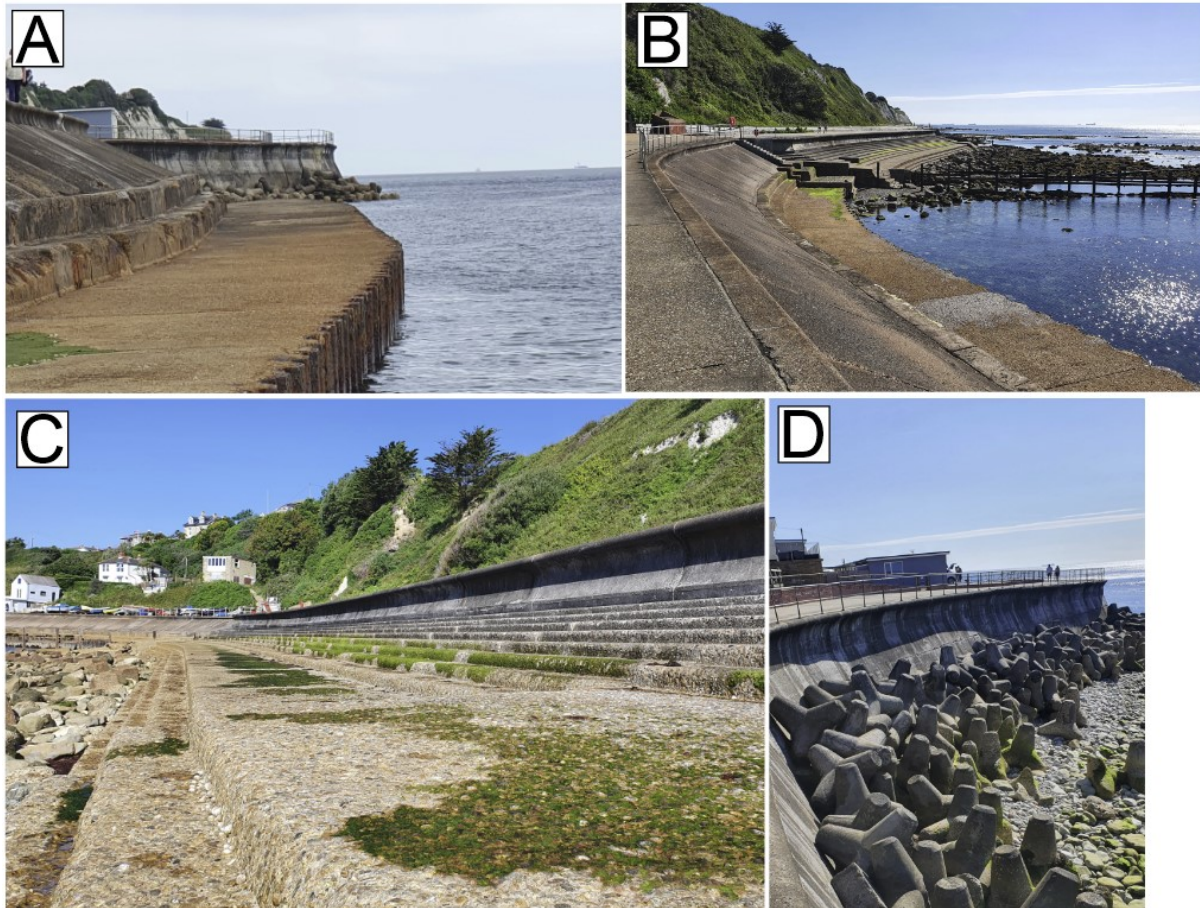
Photographs of examples of the coastal defences around Ventnor town. A: Exposed sheet piles along the sea wall, B: seawall section with old wooden groynes and small amount of shingle, C: close- up view of the seawall with steps, D: rock armour along the seawall near the marina.
